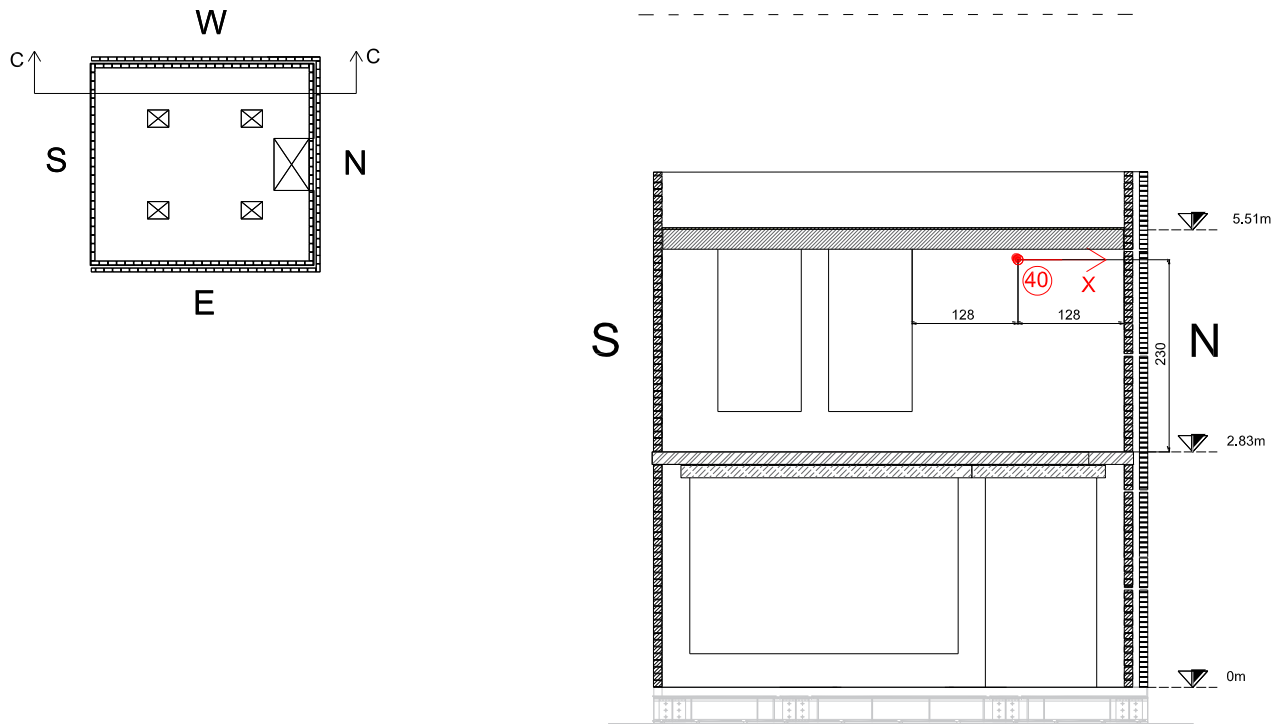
Accelerometer elevation: West calcium silicate inner leaf - Section C-C.
